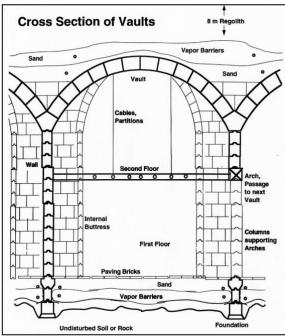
Details of masonry construction, Underhill 3 area. Note multiple layers of vapor barriers to catch gas leaks. Second level is fiberglass and bamboo panels suspended by cables. (Mackenzie, Mars Foundation)
